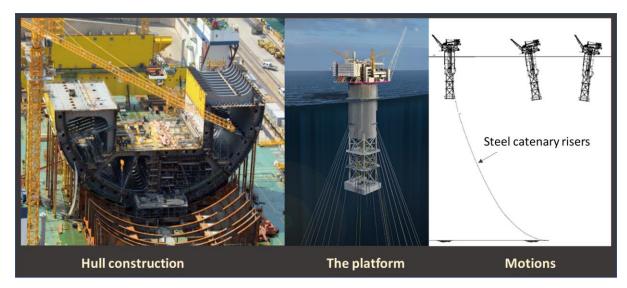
The Aasta Hansteen platform. (Source: Acona)
